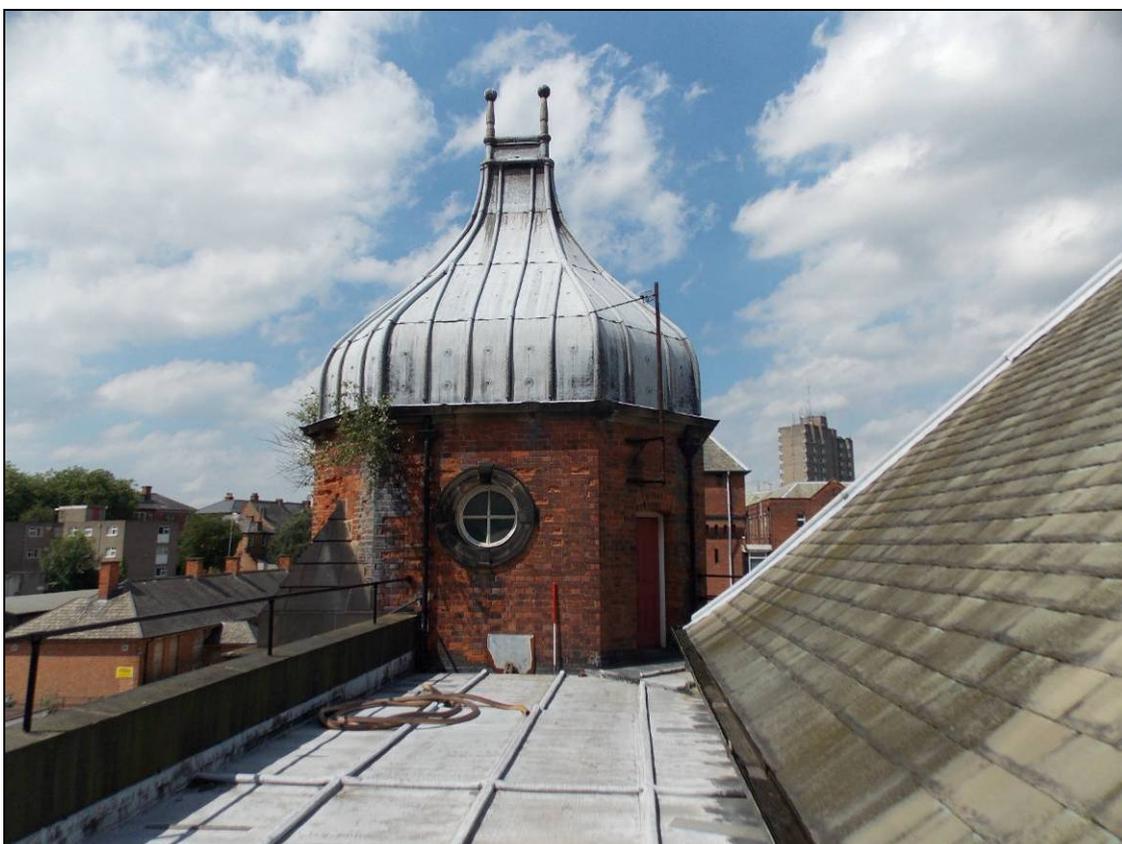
Detailed view of the western tower, looking west (scale 1m).
